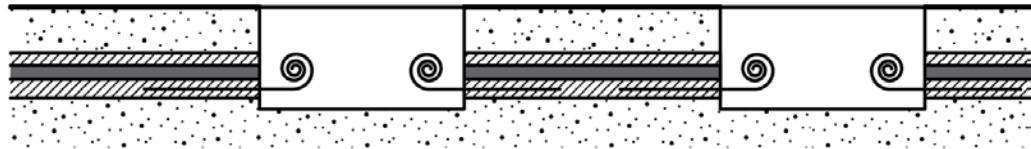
Concrete duct bank conduits entering a vault or handhole
